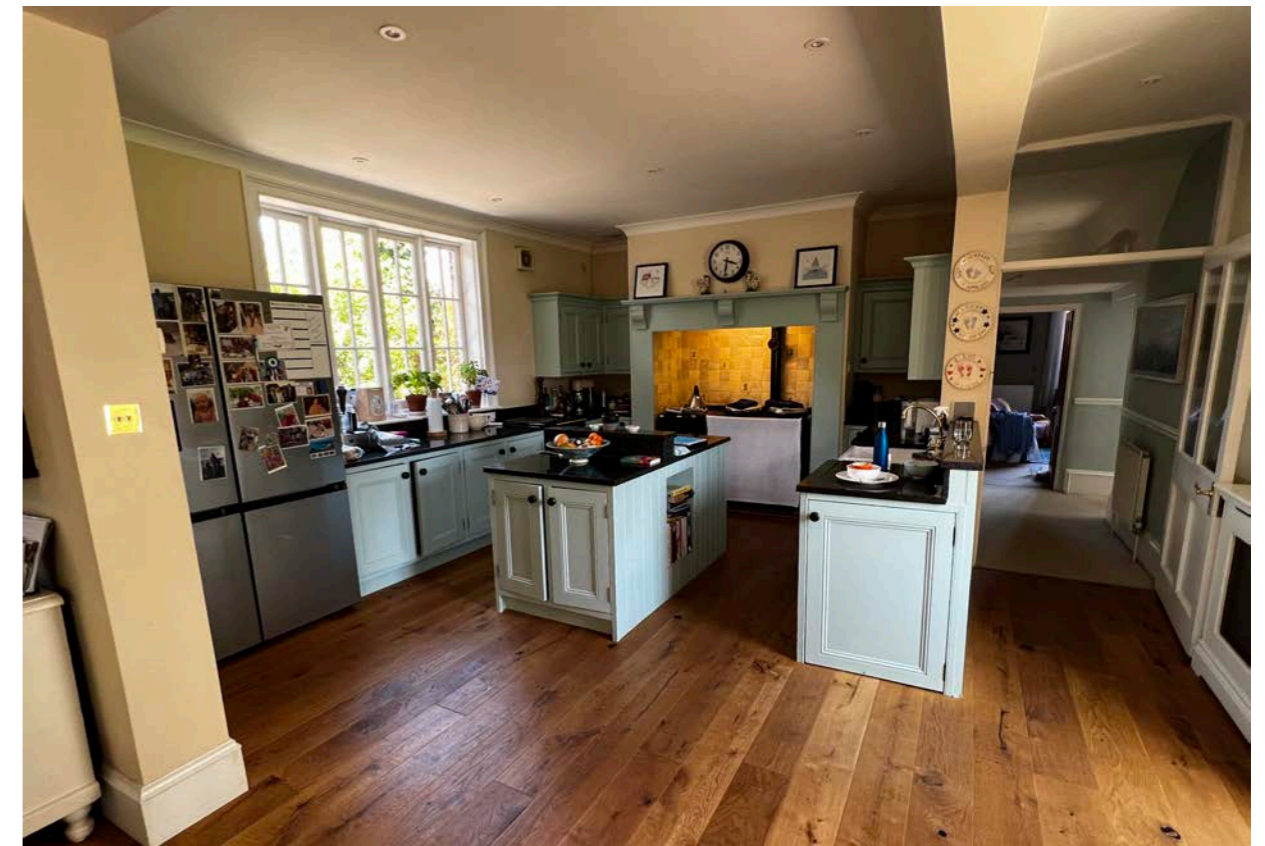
existing kitchen constructed 1992 and internal walls of former workshop removed about 2002/3
